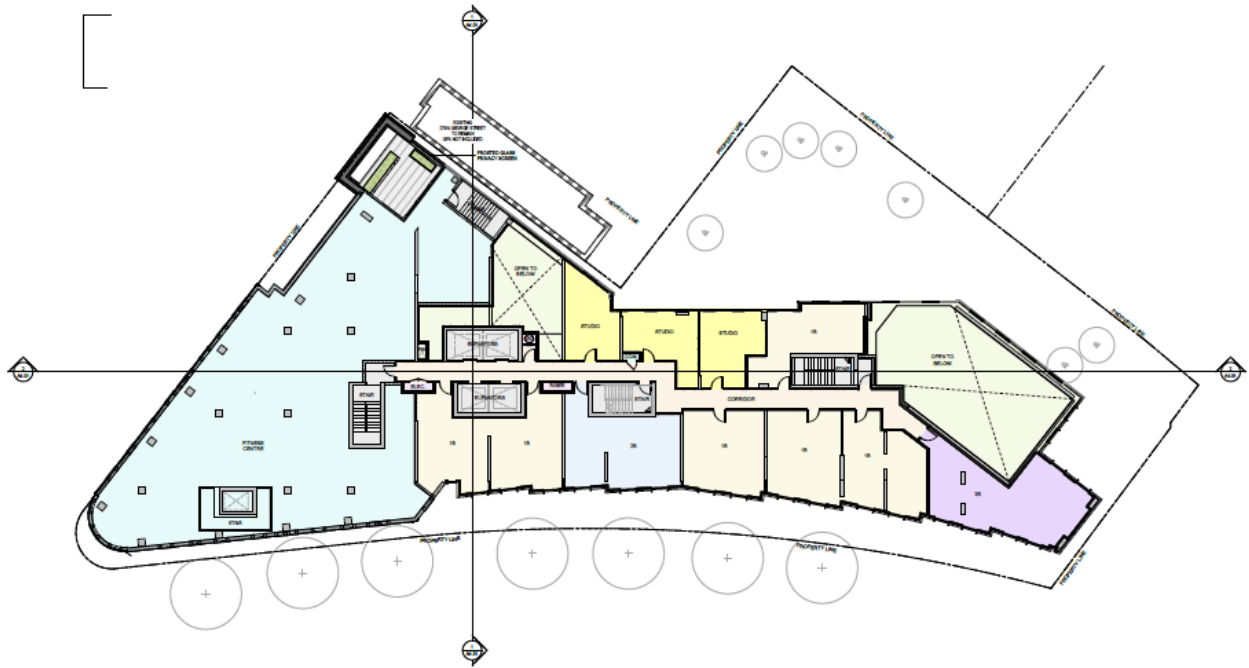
Level 3 floor plan for 212 Dundas Street East included for illustration purposes (Rafael & Bigauskas Architects Inc., February 23, 2026).
